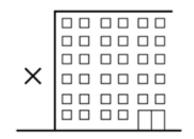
Monolithic façades 'hole in wall' must be avoided
